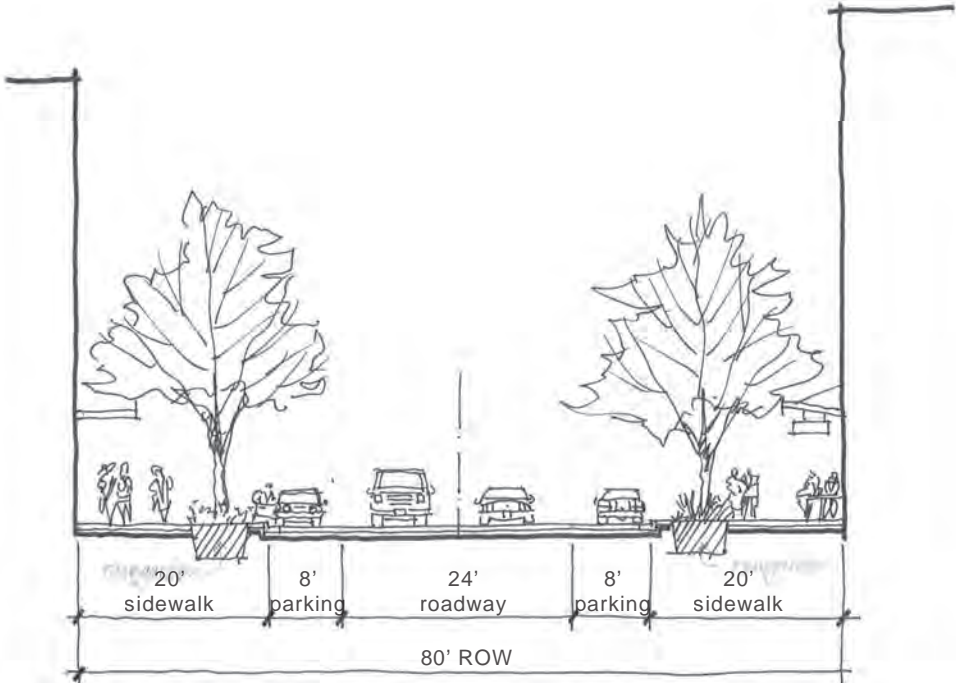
| Street Section B - Market Street Looking South, between S. 17th Street and University Terrace
